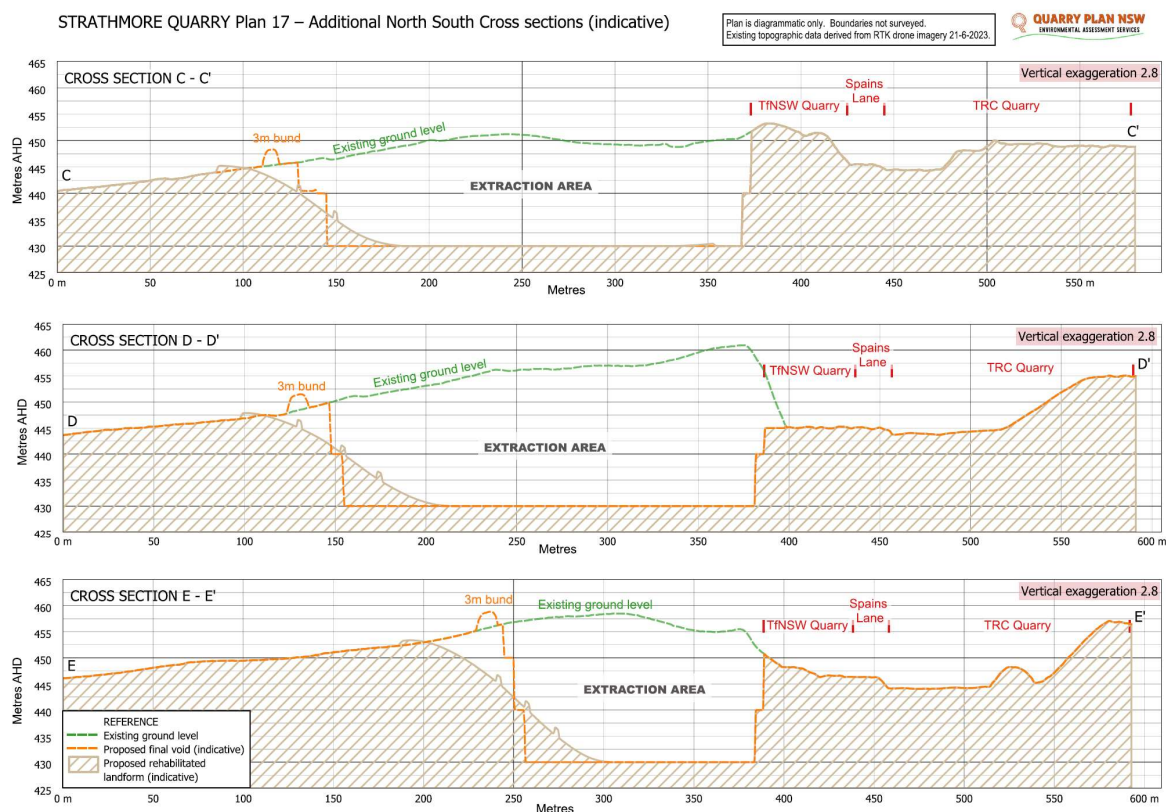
Cross section of the proposed quarry and adjacent Transport for NSW quarry. Plan 17 from the Plan Set prepared by Quarry Plan NSW.
